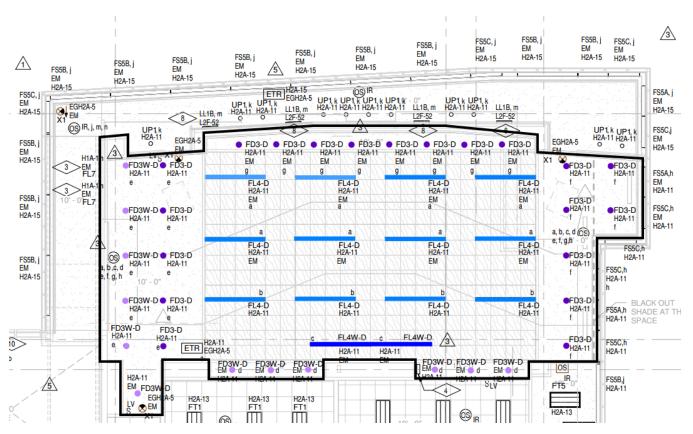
| Second Floor Lighting Plan Multipurpose Room
